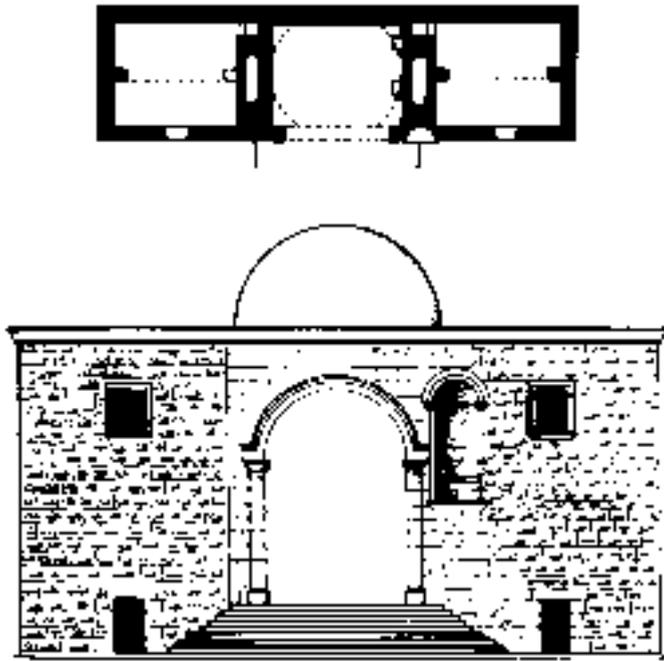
Il-Haiyat, the "Kalybe" Temple, plan and suggested reconstruction.
